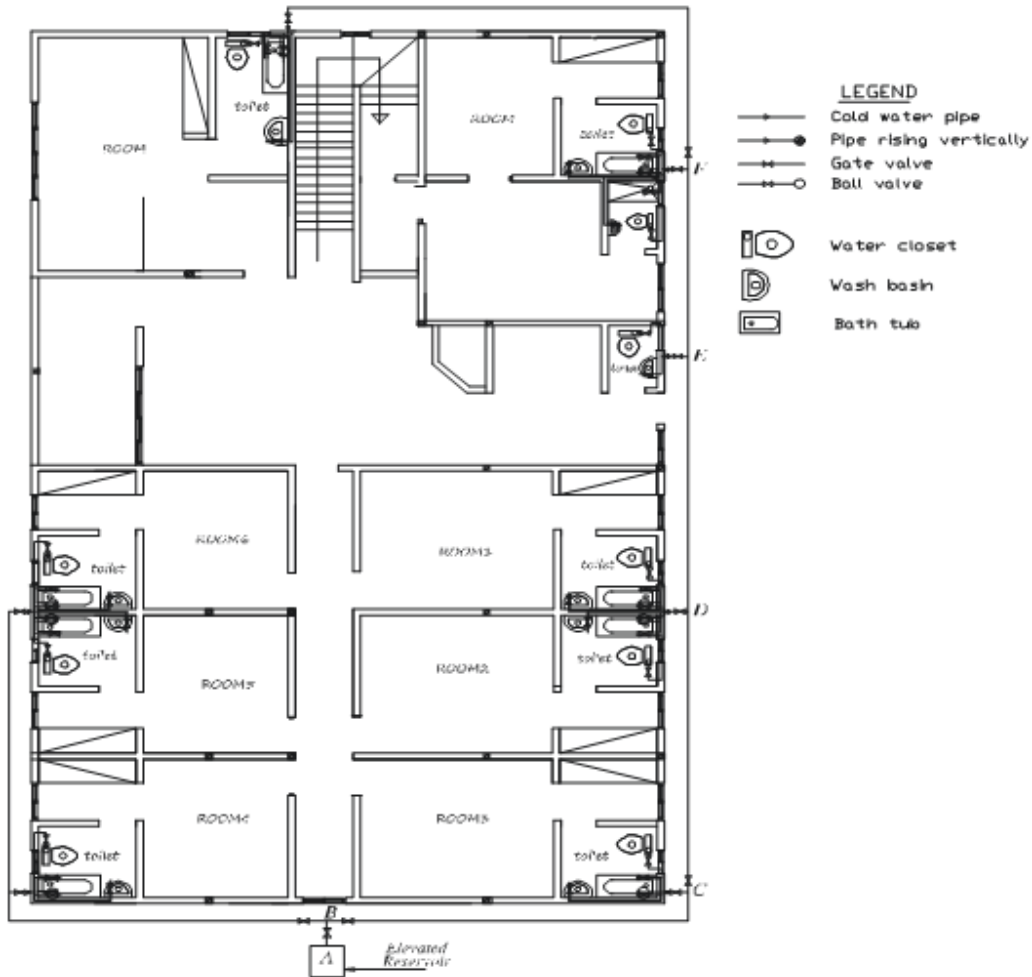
Typical Floor Plan of Water Distribution to a 36-Room Hotel Building
